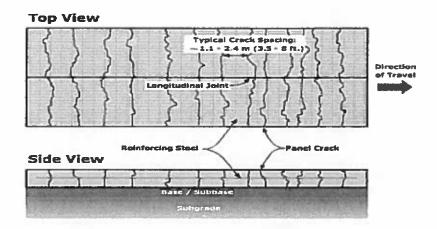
Continuously Reinforced Concrete Pavement (1/)
